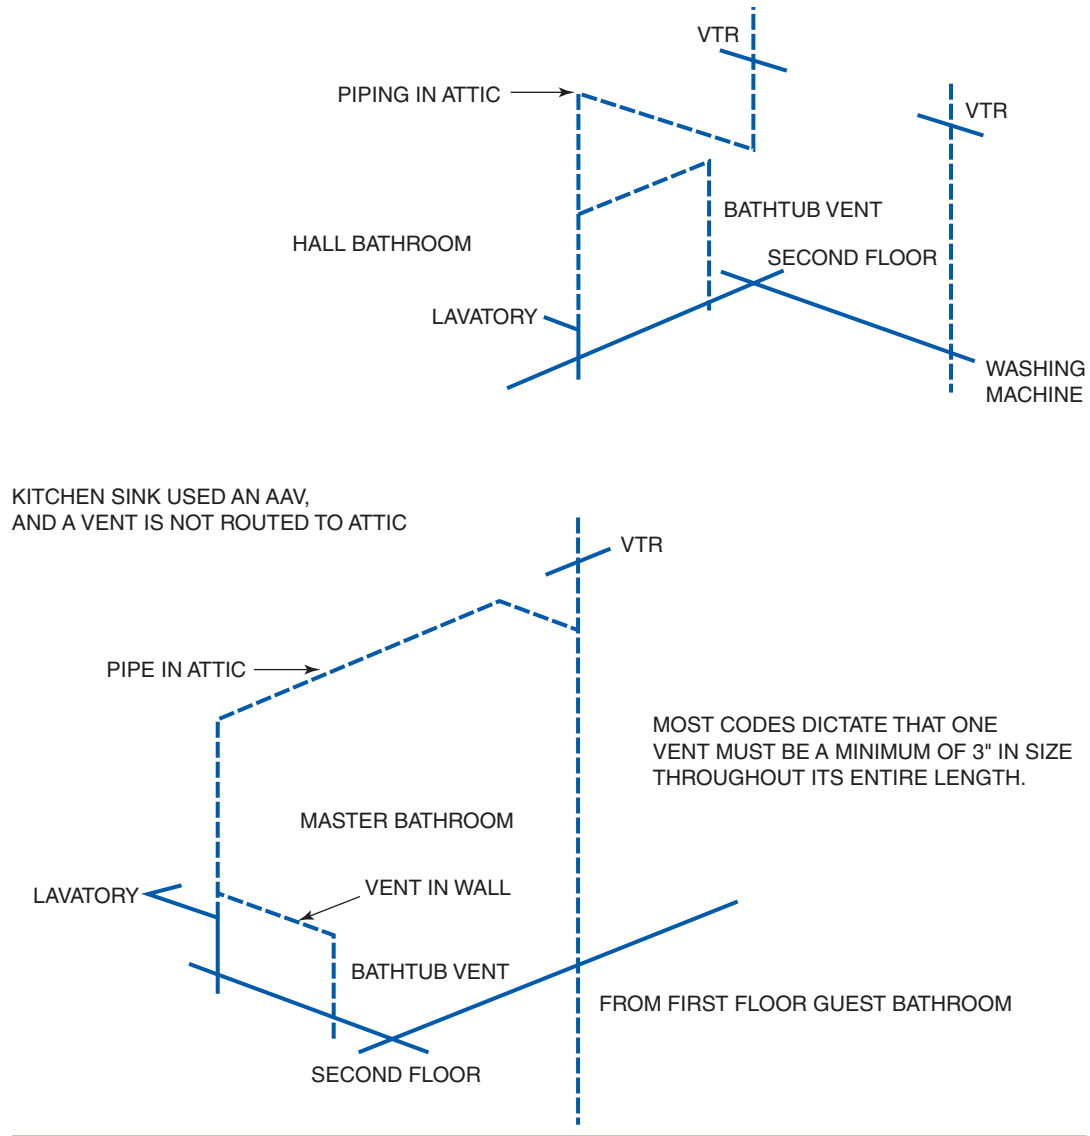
A venting system can be connected together throughout a house or in the attic, and a vent pipe can be terminated through the roof independently.
